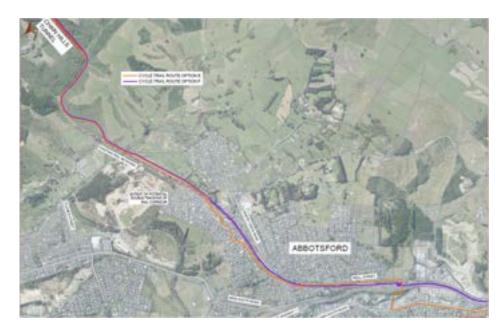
Section 2 of the Dunedin Tunnels Trail alignment Chainhills Tunnel to Harraway Road underpass
